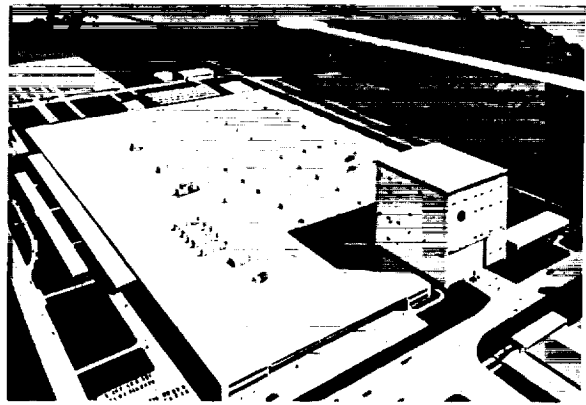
Vertical Assembly Building, Michoud plant (artist's concept).
